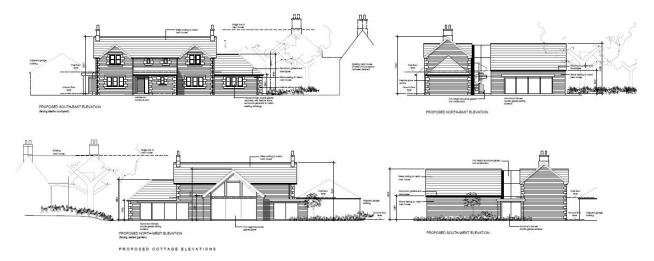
Proposed elevations of new dwelling in context with Evistones House.
